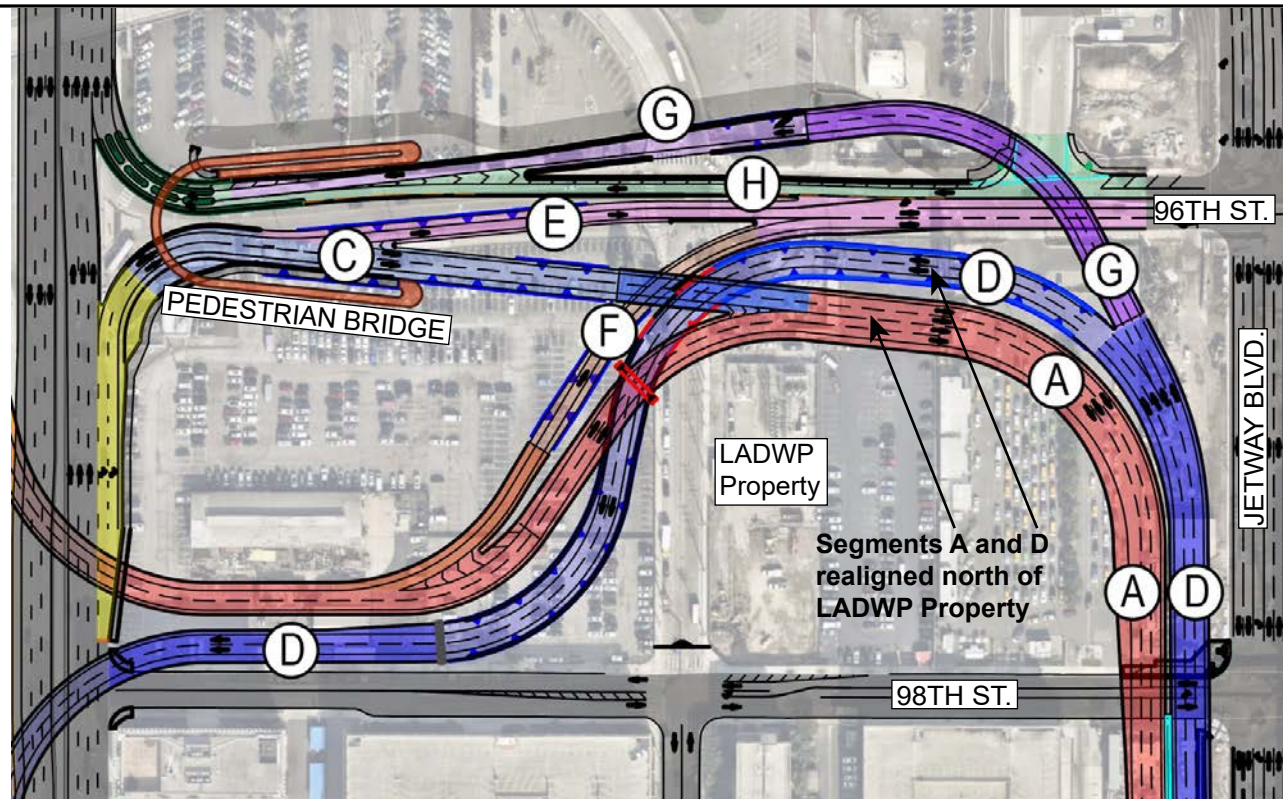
Between Jetway Boulevard and Sepulveda Boulevard, roadway Segments A and D would be realigned to avoid the LADWP property; the realignment would also reduce operational impacts on the Sunrise Parking property.
